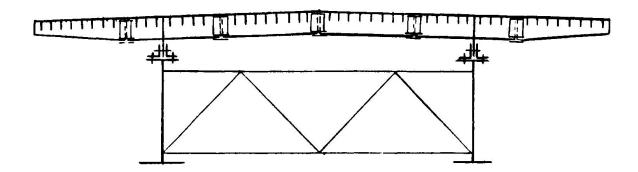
Cross-section of unificated steel superstructure with a covering orthotropic plate.
